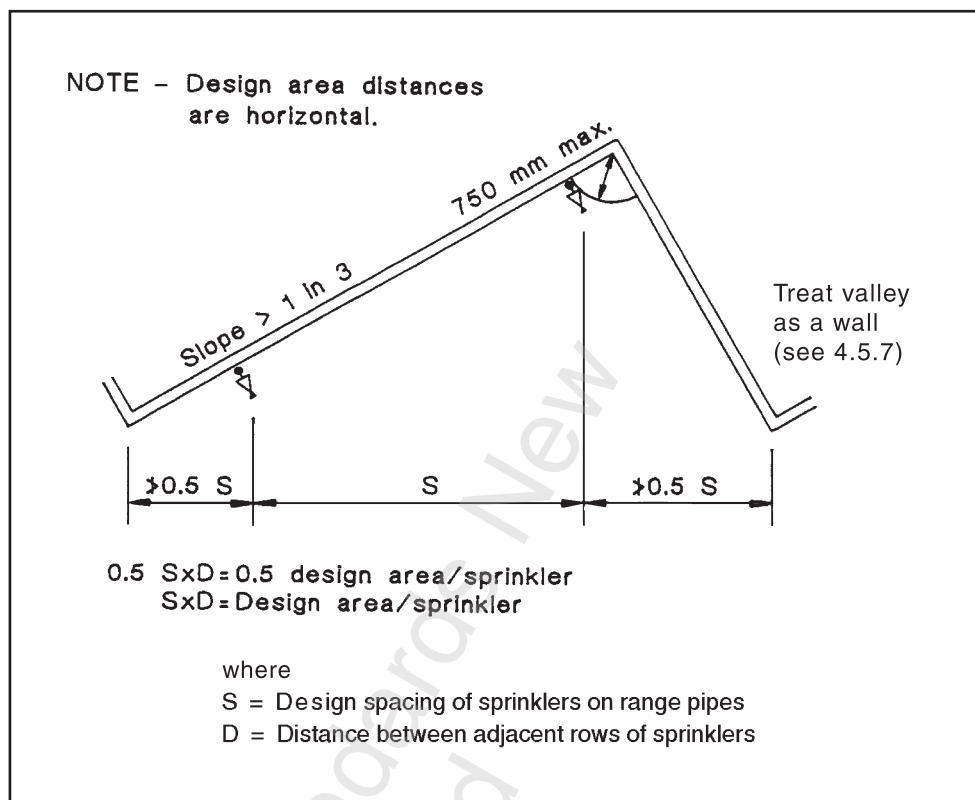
Location of non-residential sprinklers in sloping roofs
